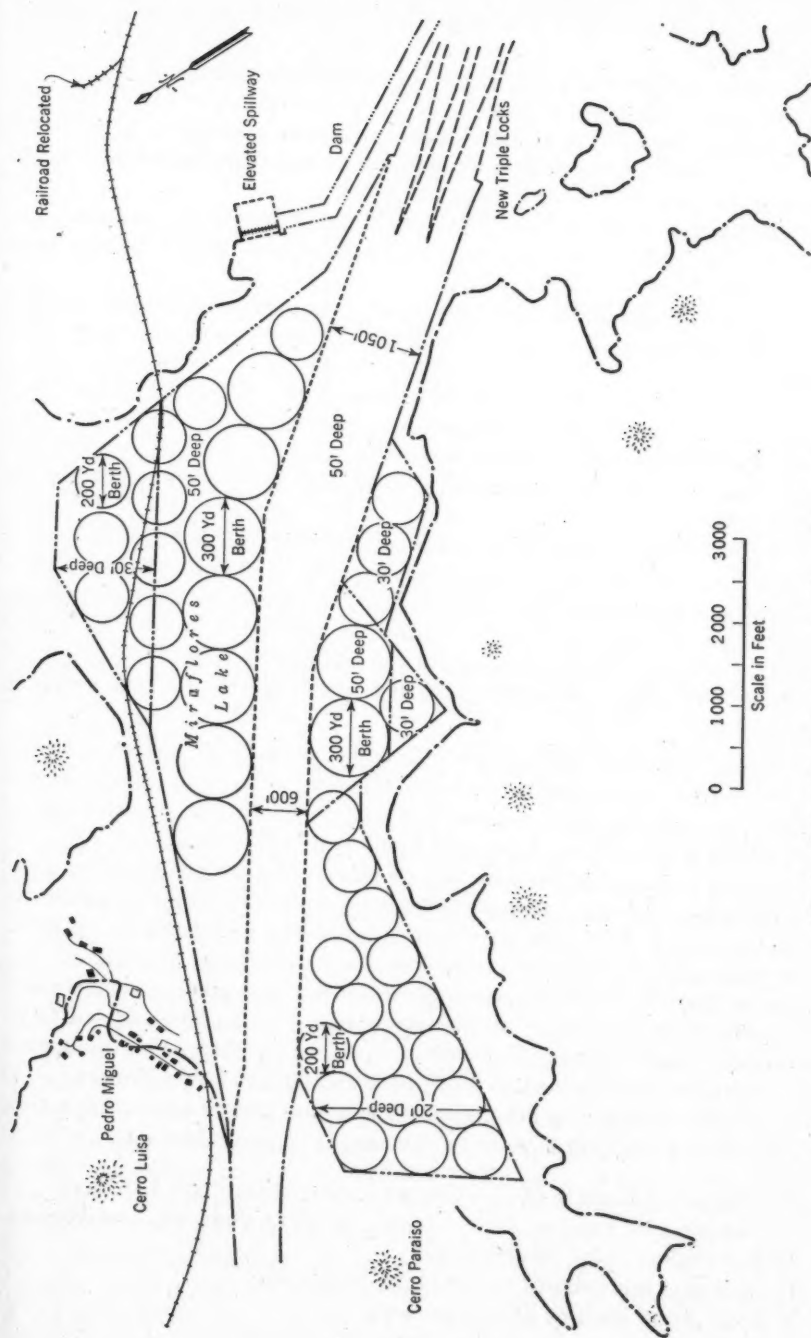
SUMMIT LEVEL ANCHORAGE IN MIRAFLORES LAKE
